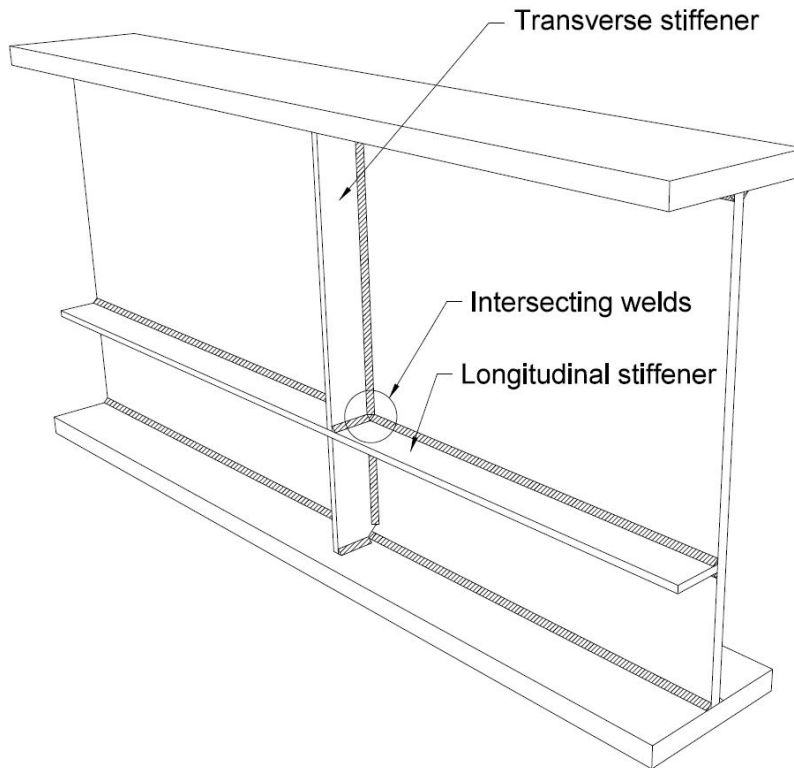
Example of improper stiffener detail with intersecting welds susceptible to CIF.
